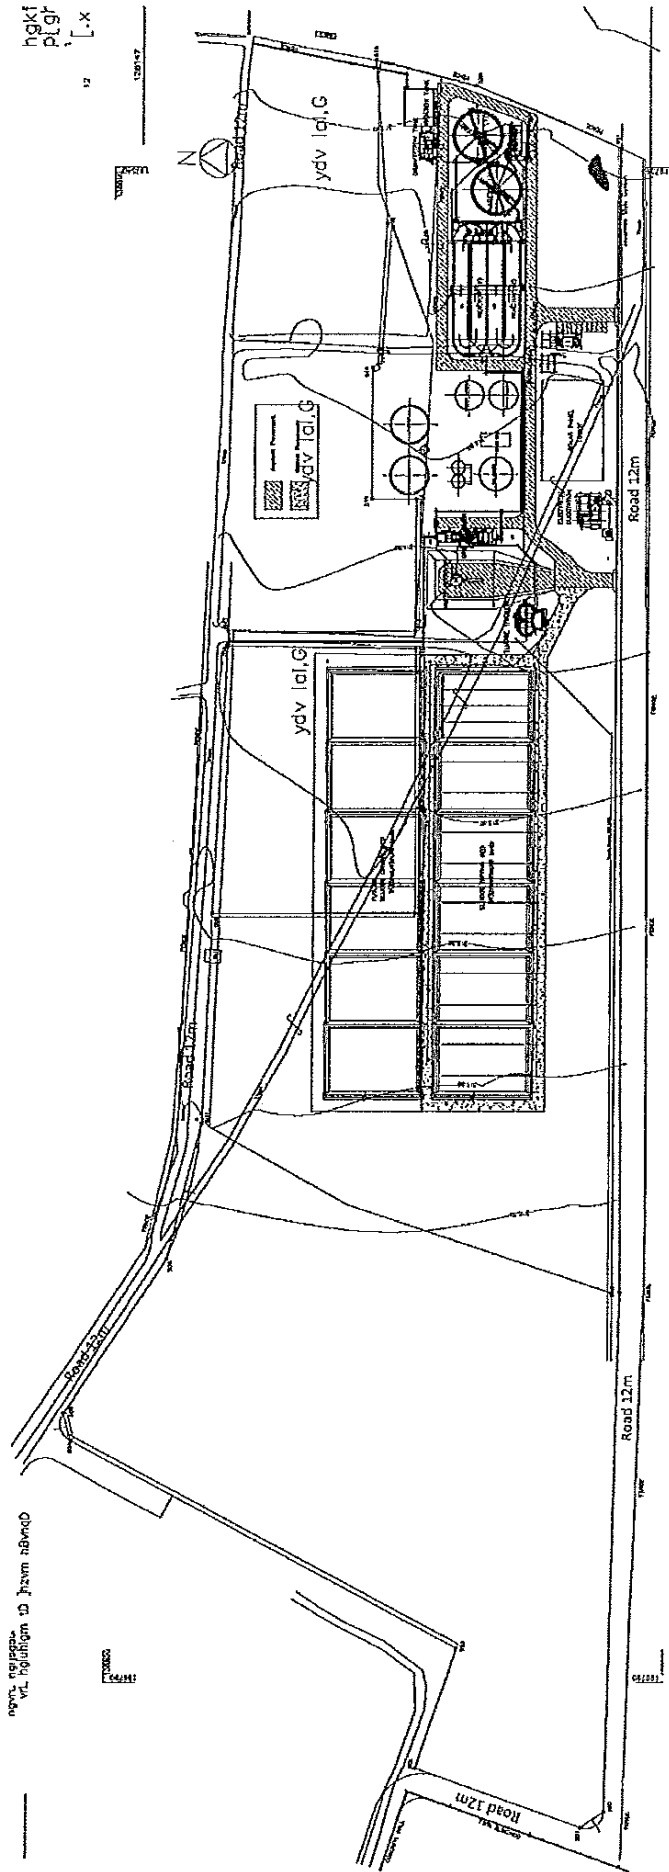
WWTP Layout plan allocated on the Regal Survey Map
